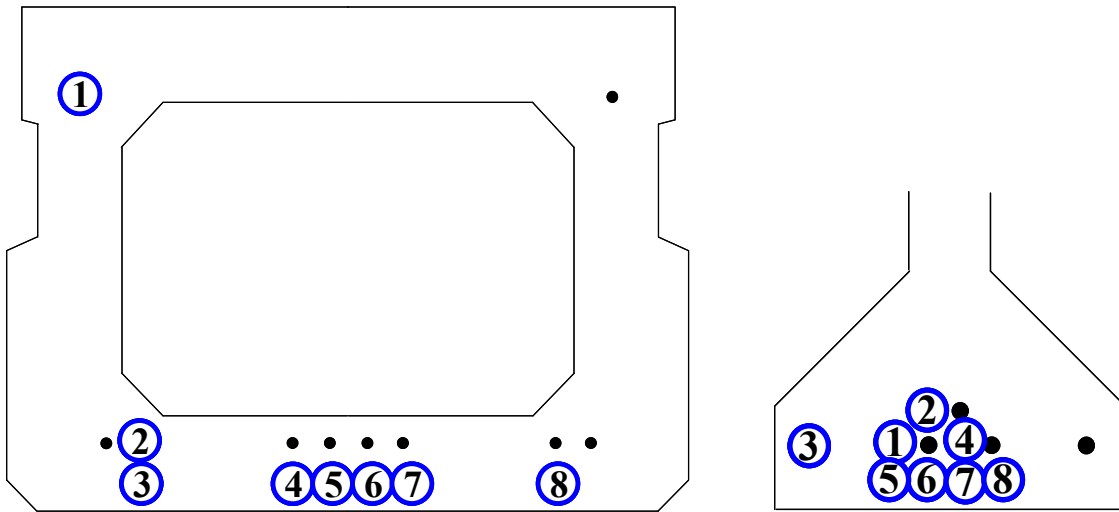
End-slip LVDT configuration for box girder (left) and I-girder (right) tests.
